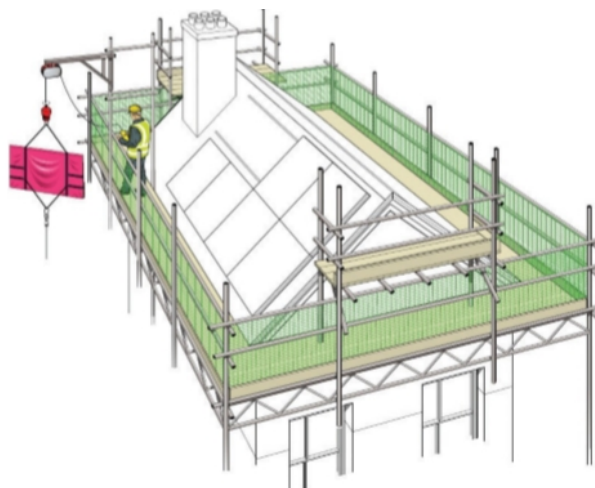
Fall protection around all edges of the roof of a domestic property during mini grid connected PV system installation
